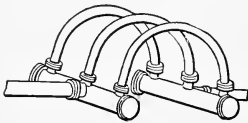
U Bends for Large Headers when Overhead Space is Limited.
